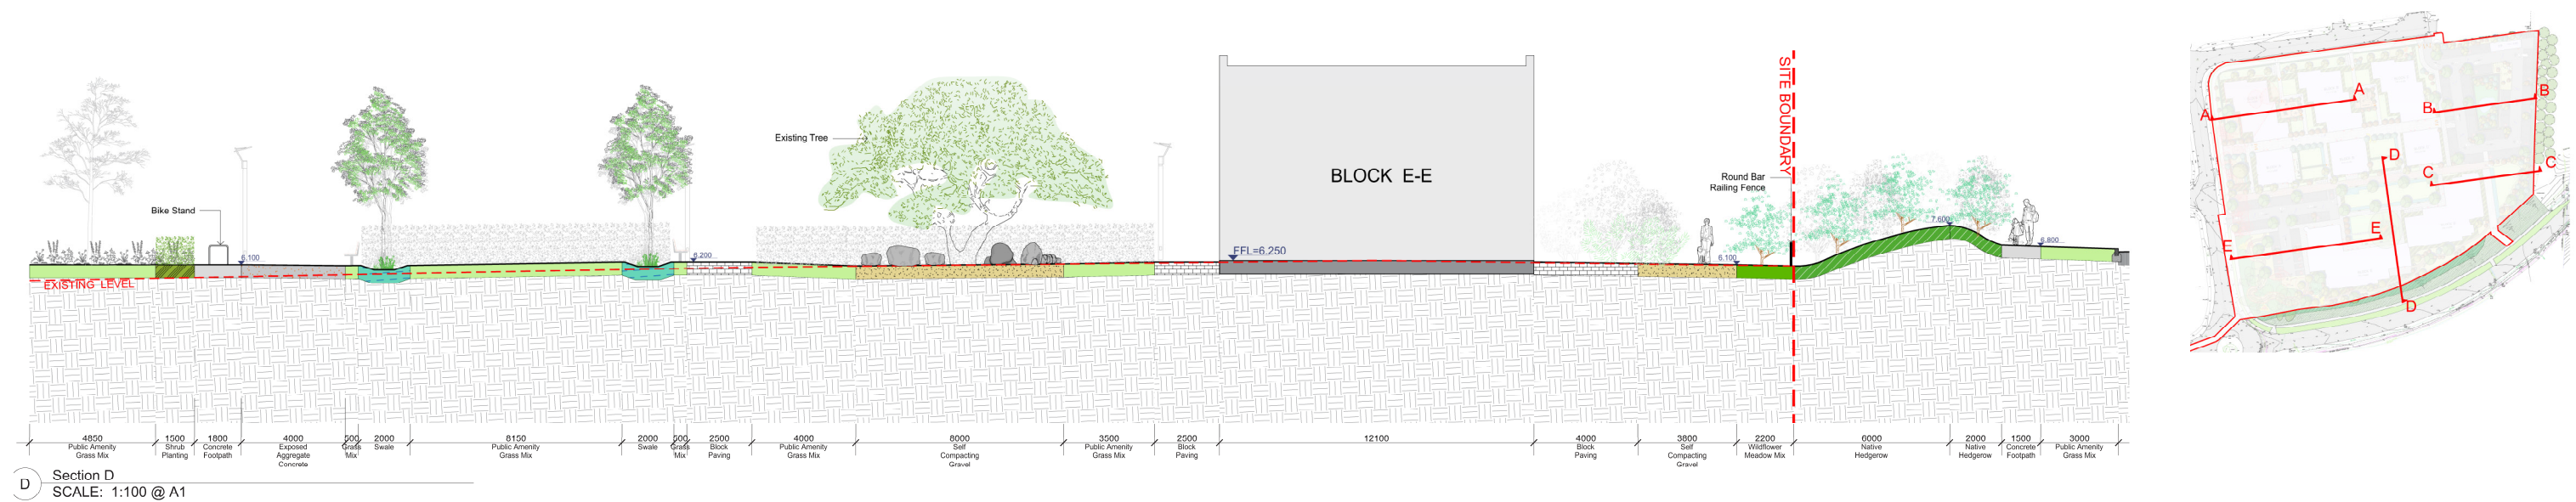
Proposed Landscaping Site Section DD, Central Open Space between B through Block D and the frontage to Mantua Road, from CSR drawing no. 25154-2-202
